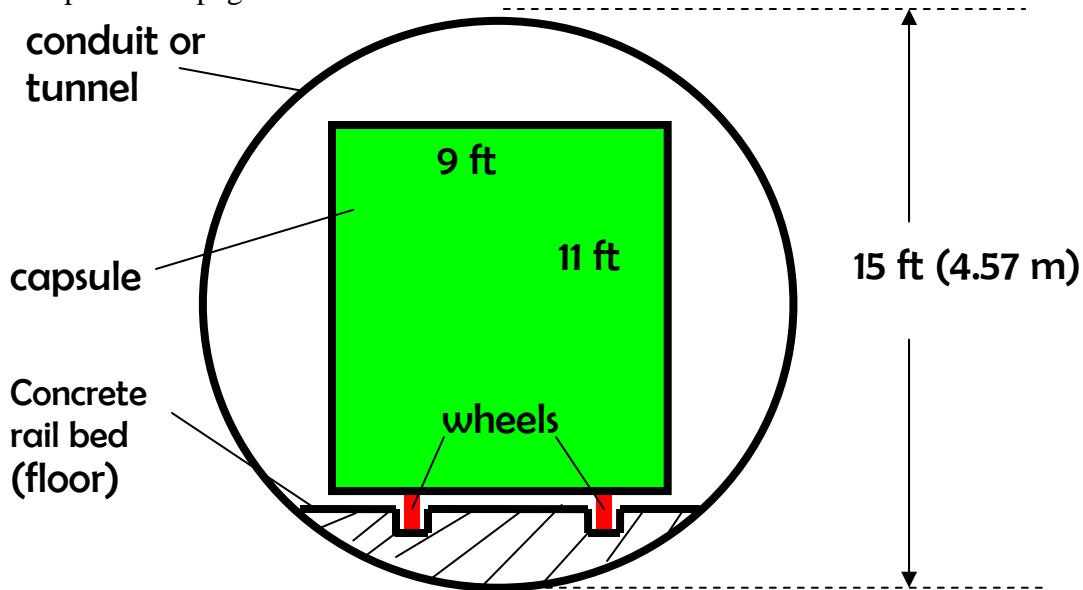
PCP capsule for carrying container through circular conduit or tunnel
